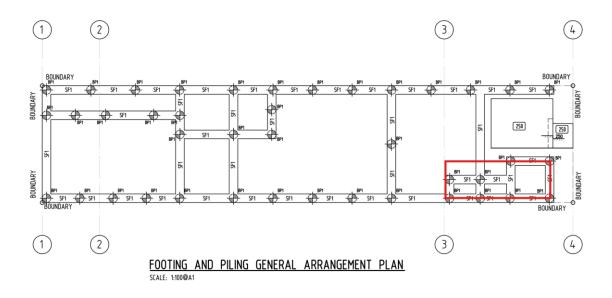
Structural Plan – Footing and Piling Plan (Submitted with this S4.55)
